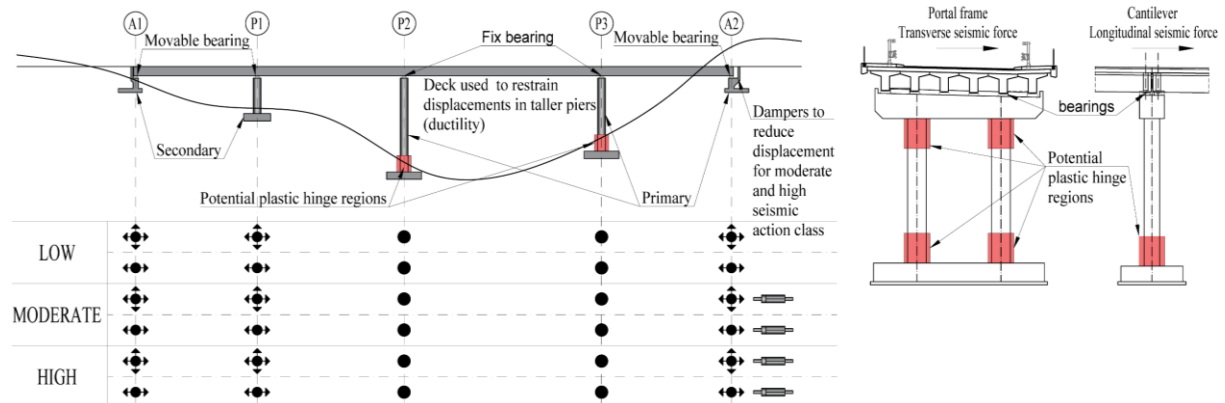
Primary and secondary members of the bridge example and the location of potential plastic hinges, reproduced based on [10]
